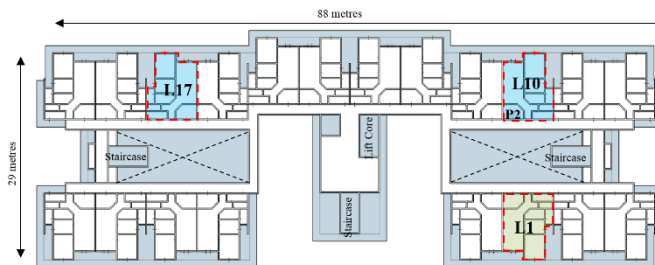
Typical floor plan of the PPR Beringin (First Generation).
